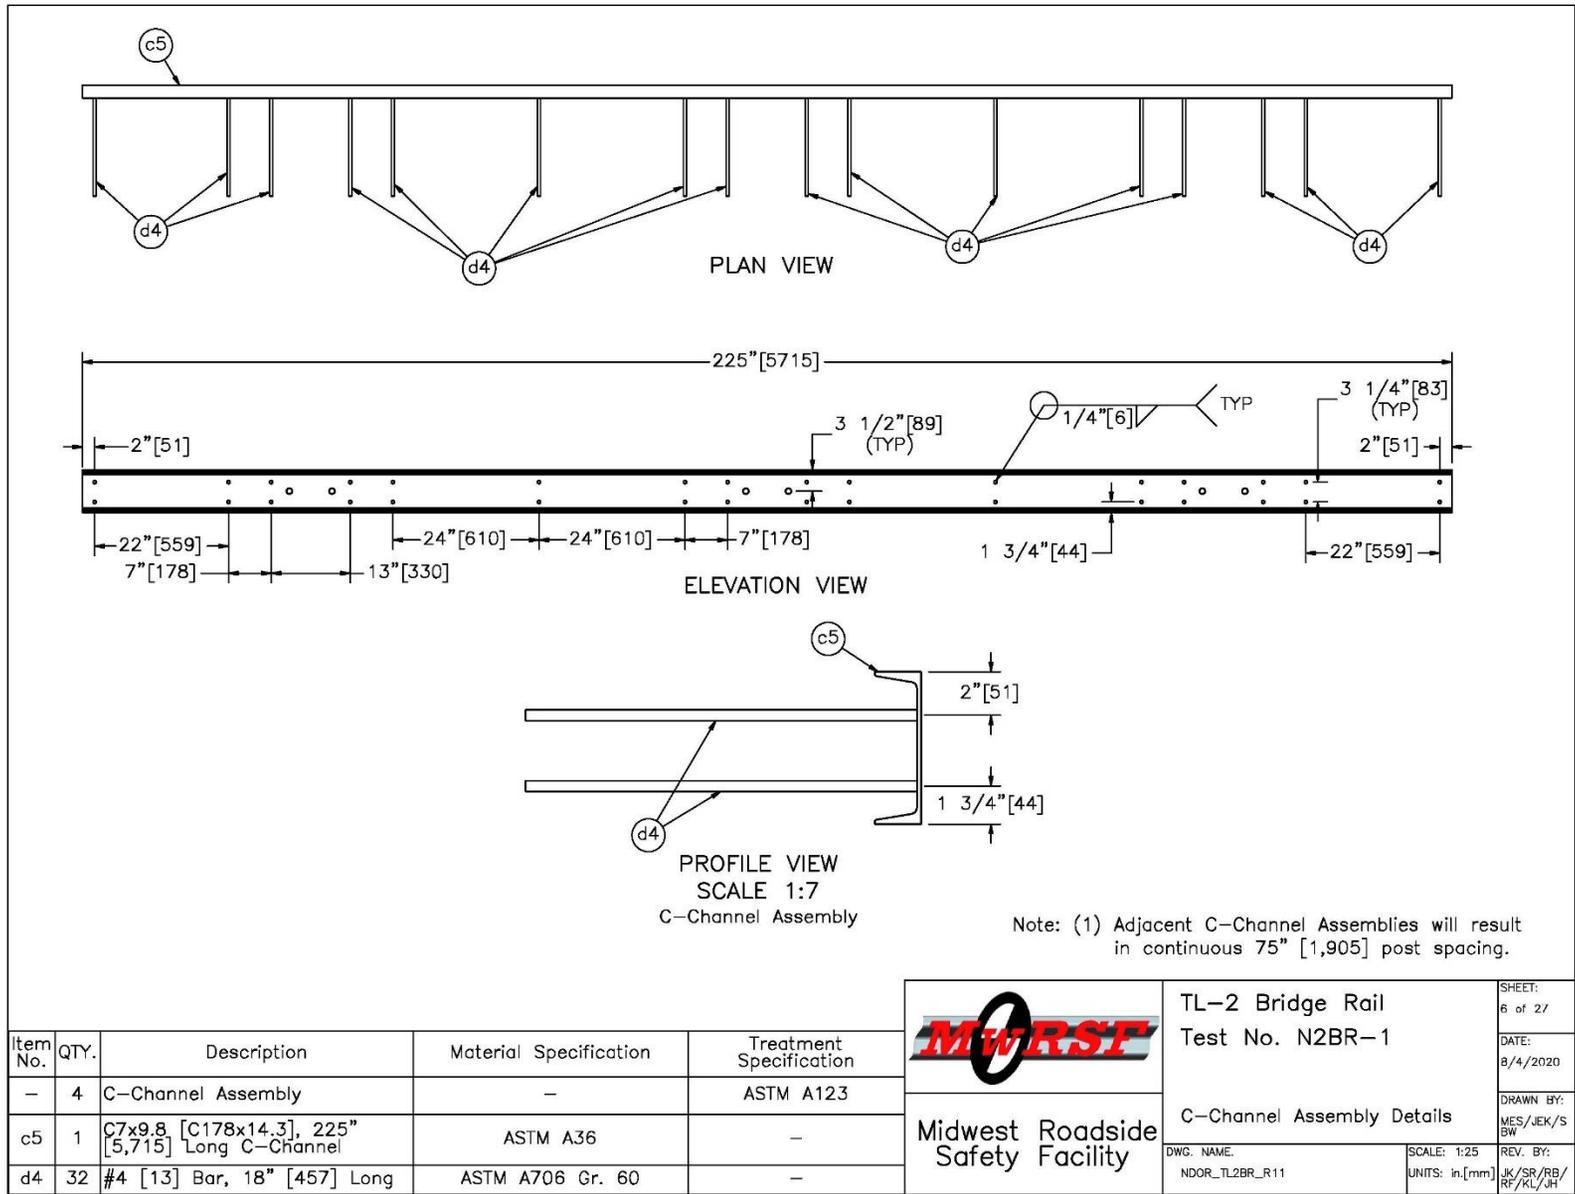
C-Channel Assembly Details, Test No. N2BR-1
